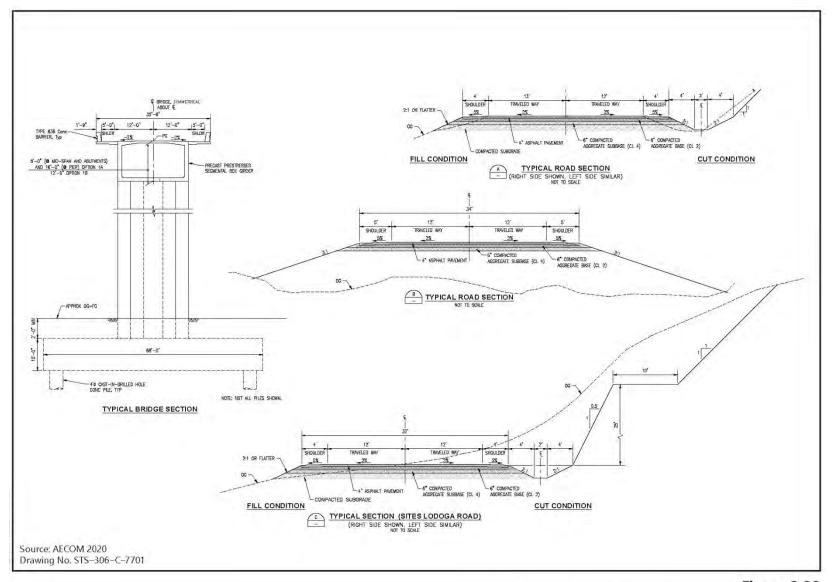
Sites Lodoga Road Realignment and Bridge
